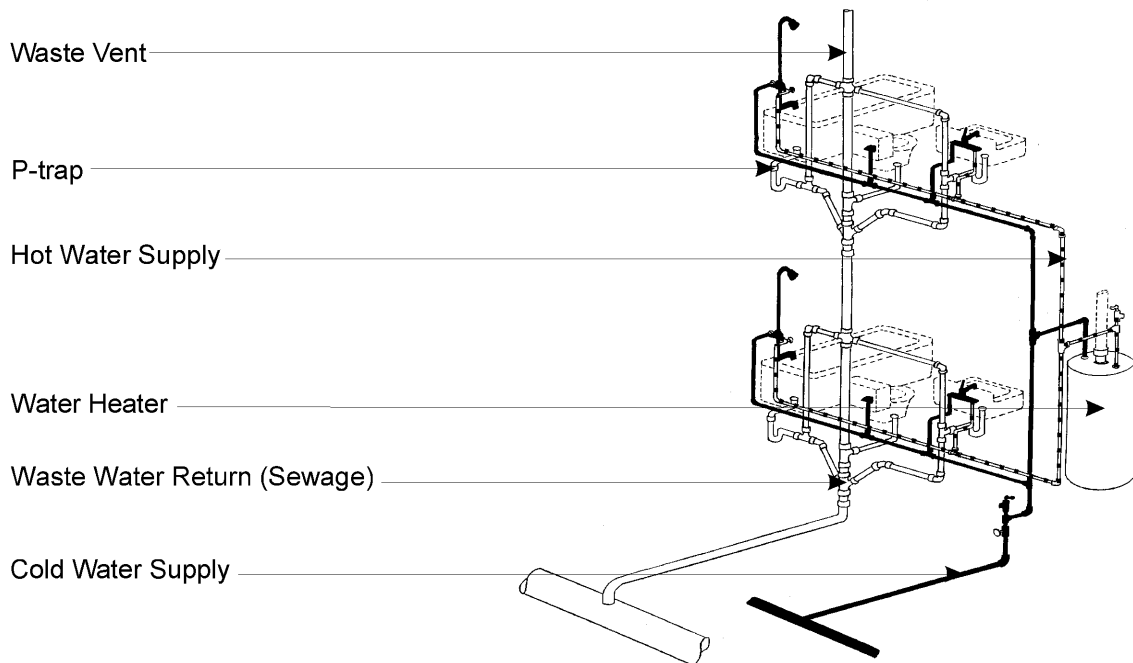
Plumbing system showing risers, branch pipes, drain pipes, traps, vents
